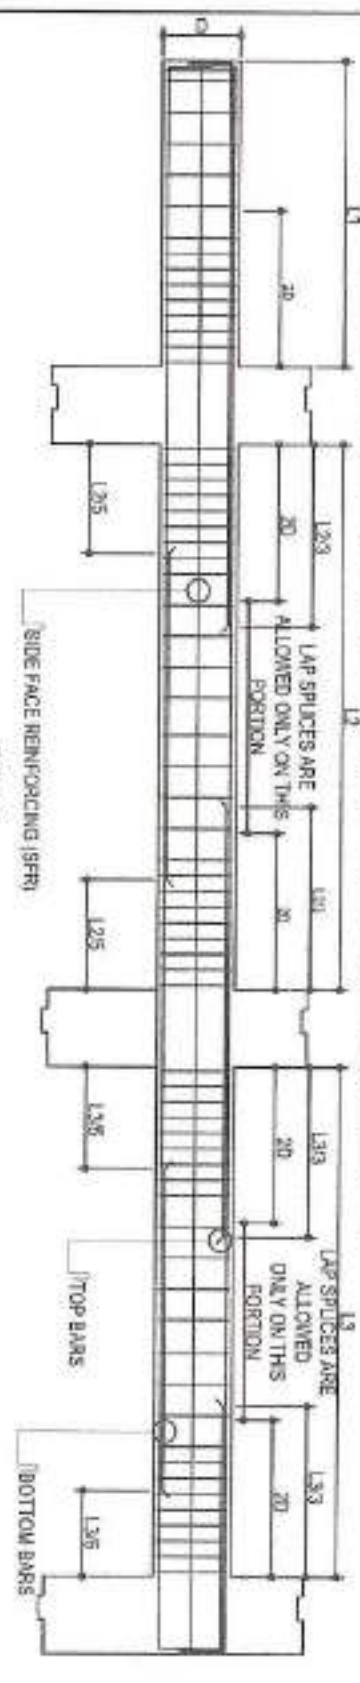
TYPICAL BEAM ELEVATION SHOWING DOWELS AND TIES SPACING
